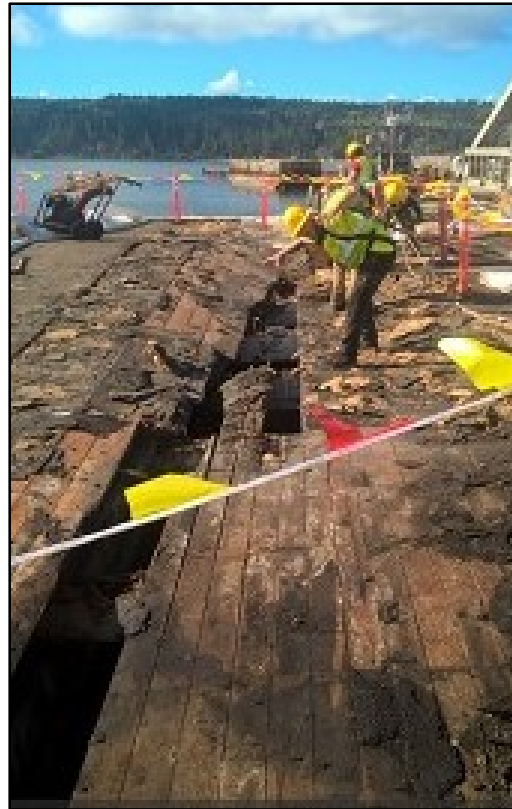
Employees using personal fall arrest systems while working near rotten roof area.
